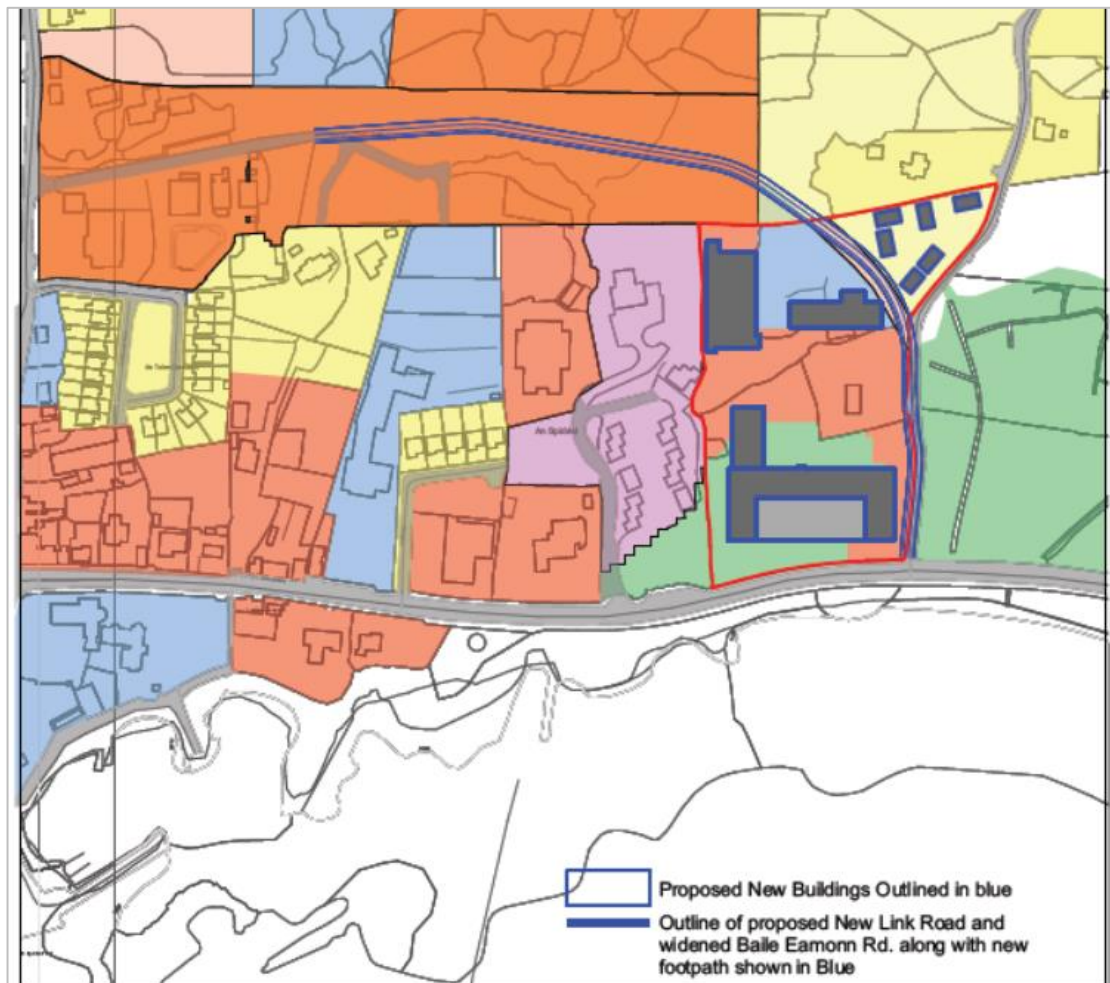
Site Masterplan overlaid on Existing/proposed zoning in Spiddal. Source: O Neill O Malley Architects
